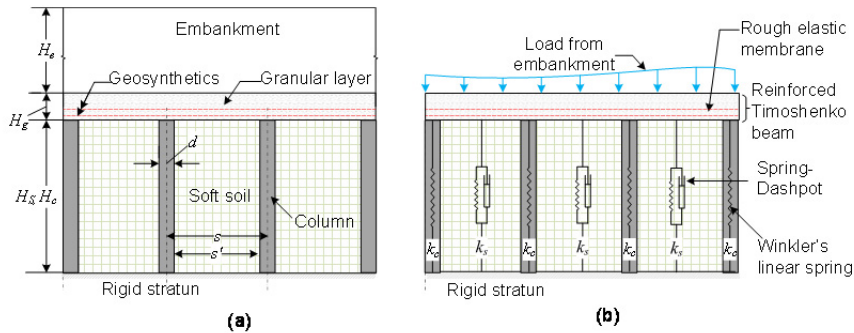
Illustration of (a) embankment on CMC-improved soft soil and (b) proposed foundation model
